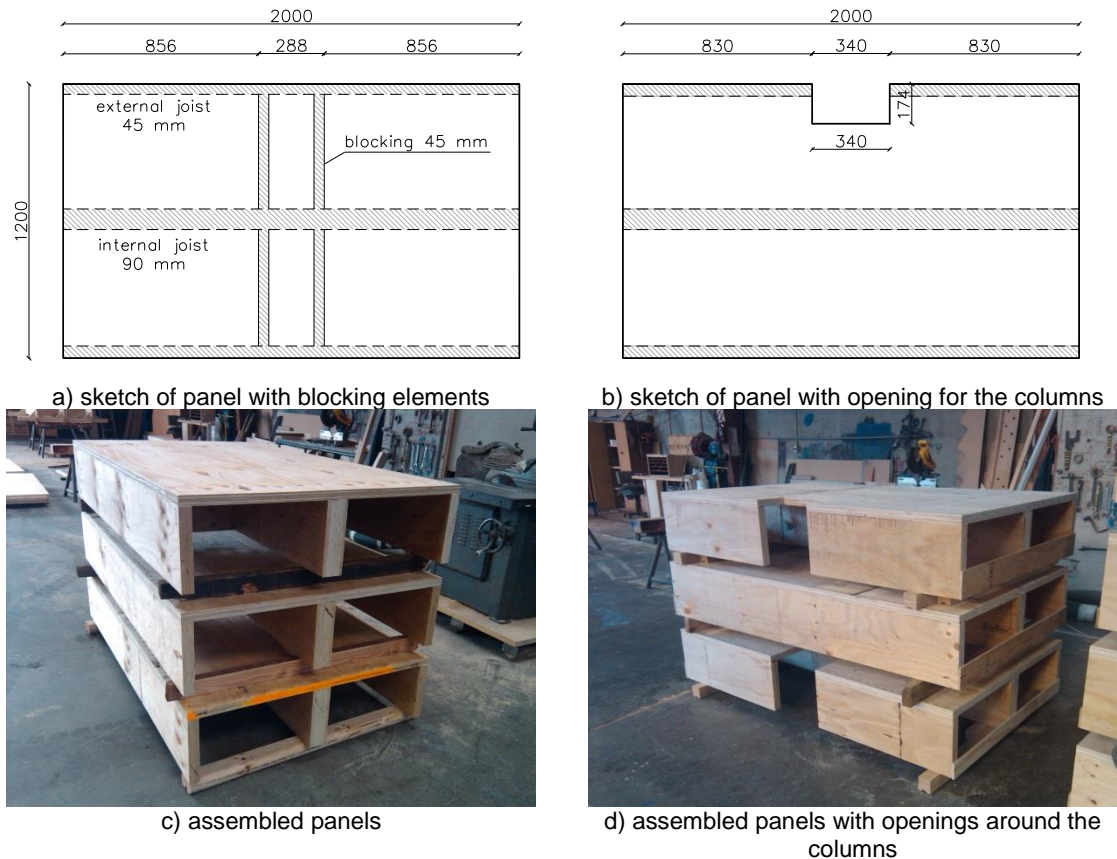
Stressed skin floor diaphragm panels (Hunter Laminates Ltd)
